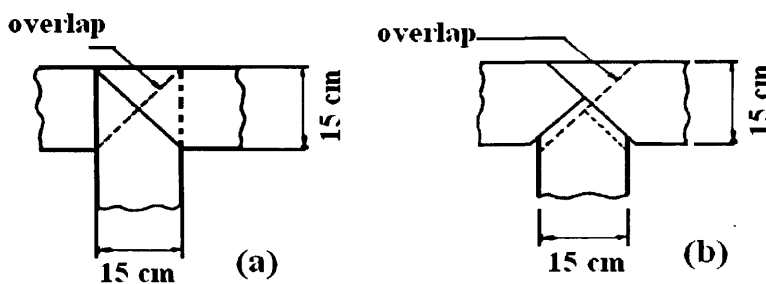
Plan view of one layer of (a) the 45° - 90° T-joints and (b) the 45° offset T-joints [1.38]
